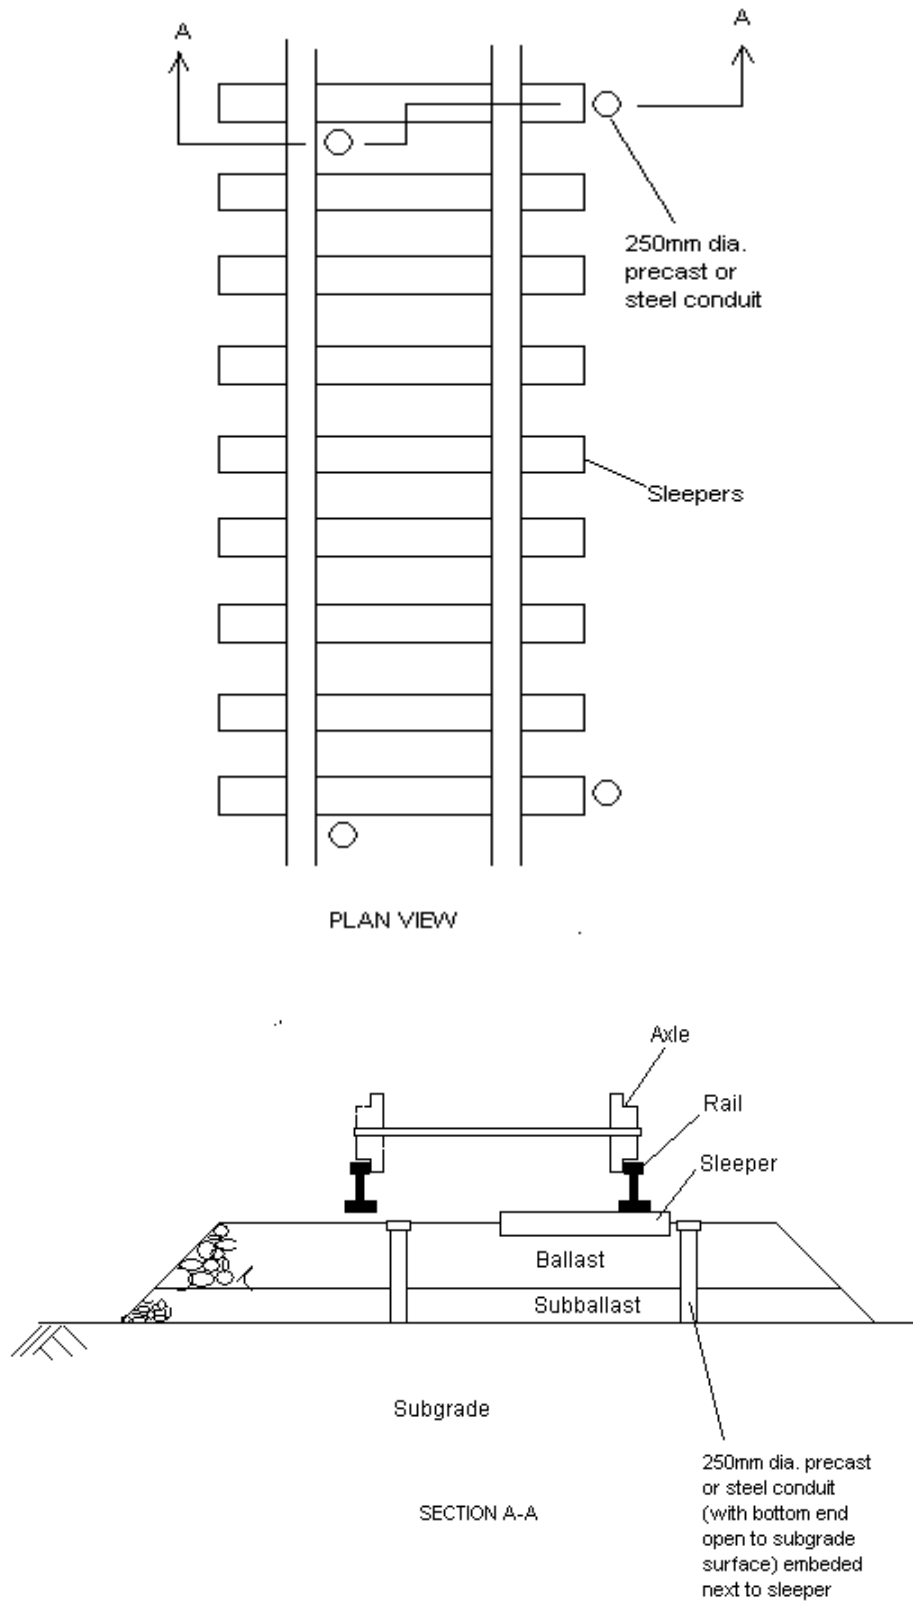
Layout and details of pre-installed precast or steel conduits (Loh and Nikraz 2011)
